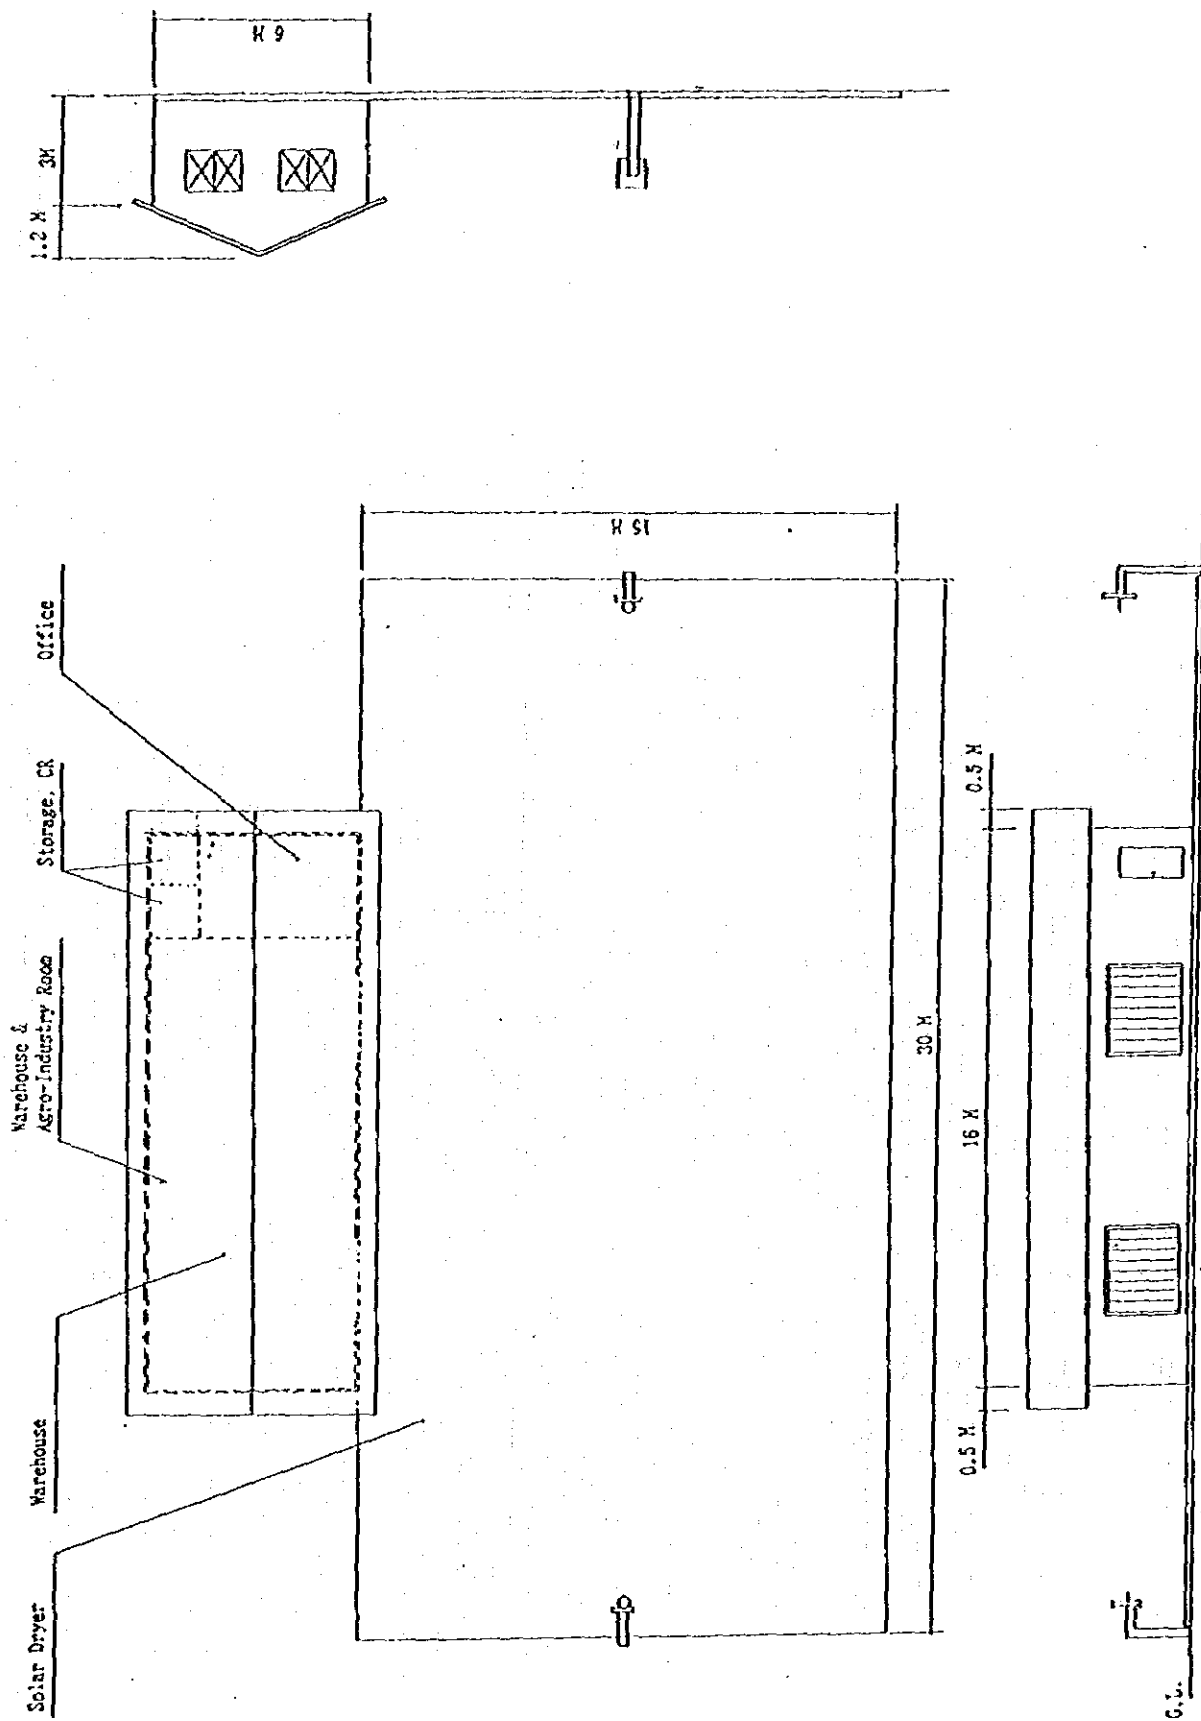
PROPOSED PLAN OF RICE OR CORN AGRO-INDUSTRY CENTER
